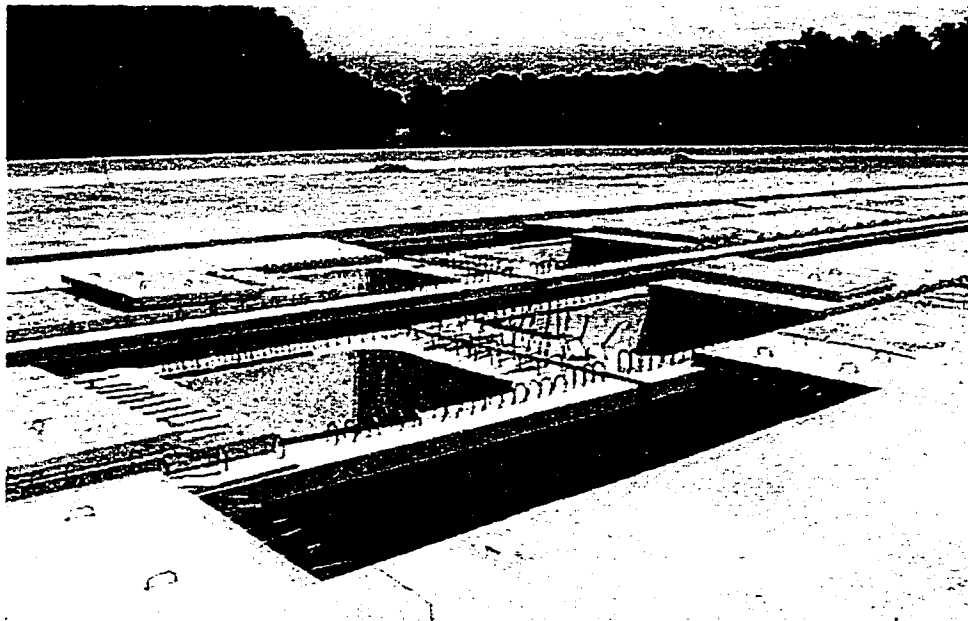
Additional Beams and Panels for Louetta Bridge Widening
